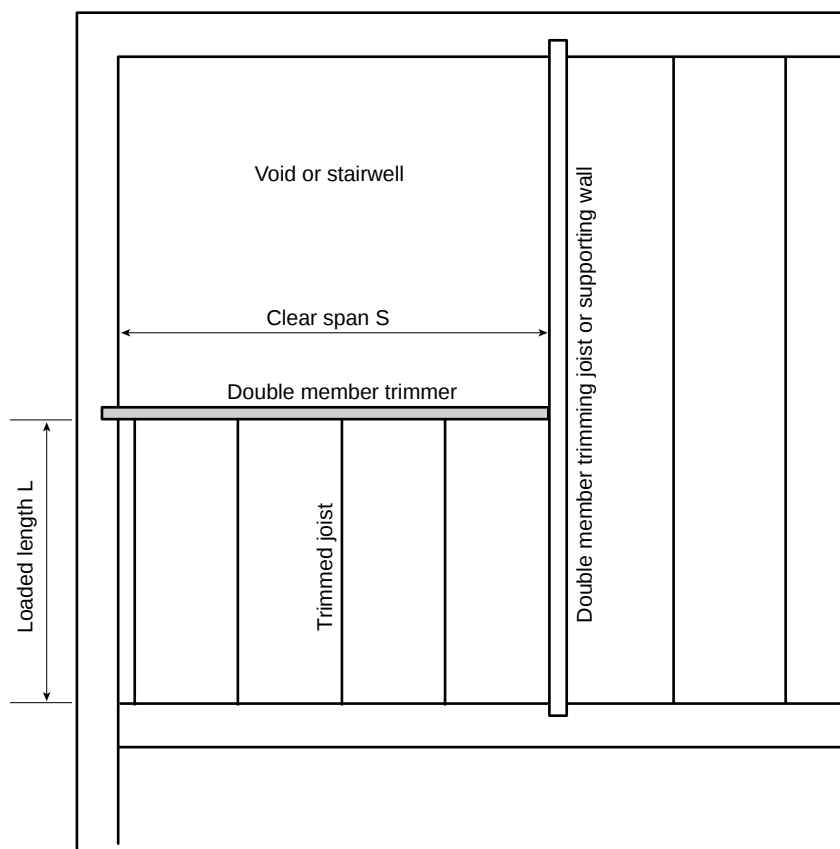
Plan on double member trimmer supporting trimmed joists
